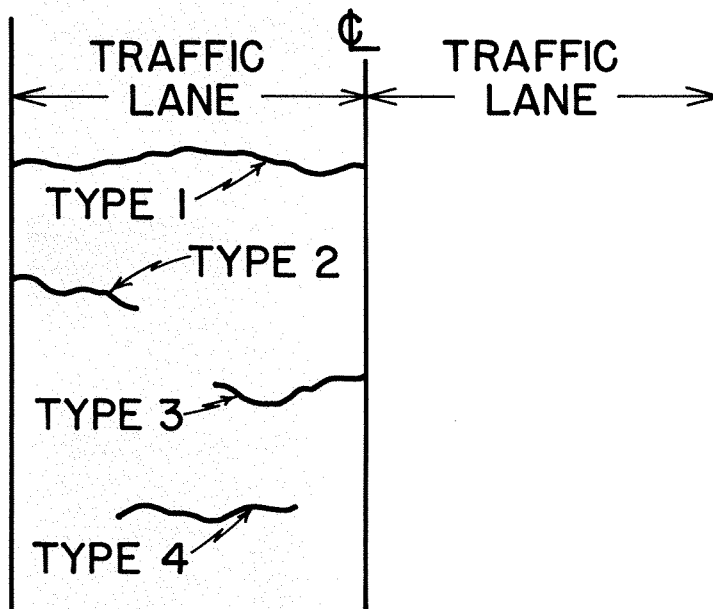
TYPES OF TRANSVERSE PAVEMENT CRACKS.
